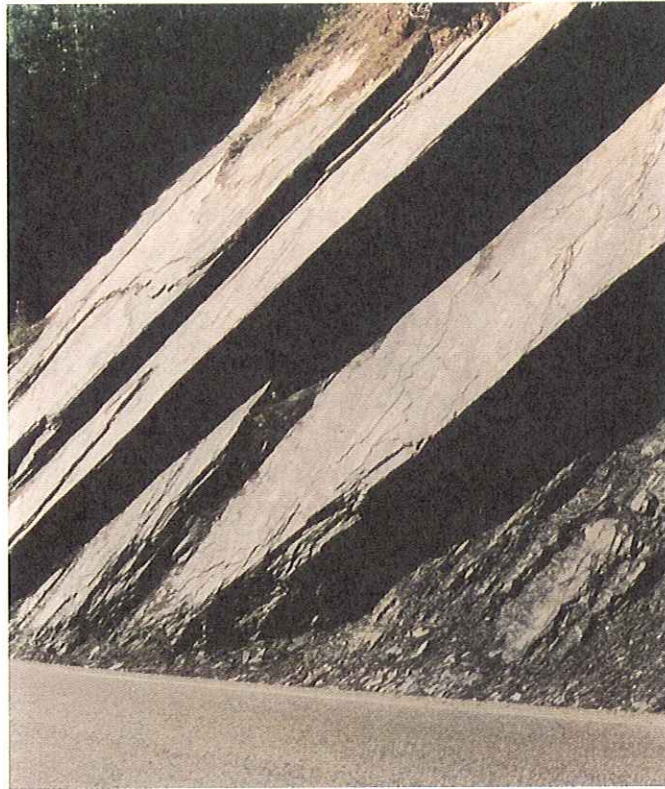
Planar failure in bedded slates. Dip angle about 55° . The strike of the bedding is about 15° off the strike of the centerline. Note the failures daylight in the ditch. These falls occurred when the blasted rock was excavated during construction.
